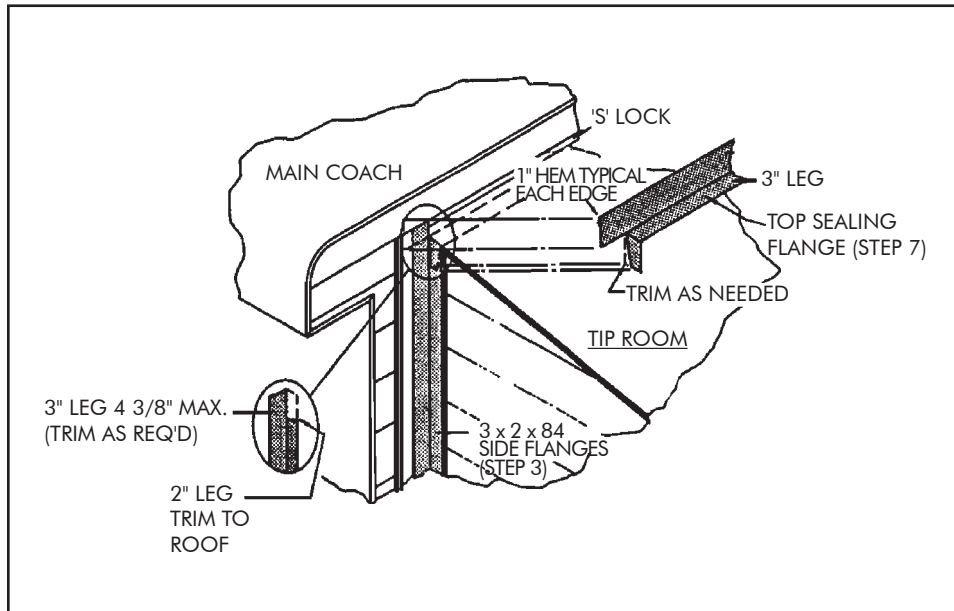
OPTIONAL TOP & SIDE SEALING FLANGES
